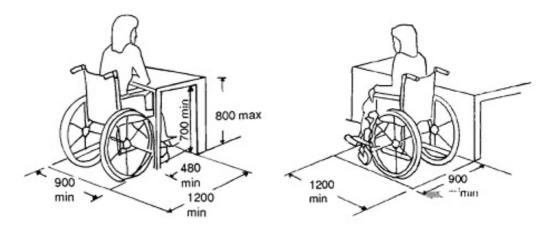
Clear floor space for a wheelchair (source: Building and Construction Authority, 2002).
